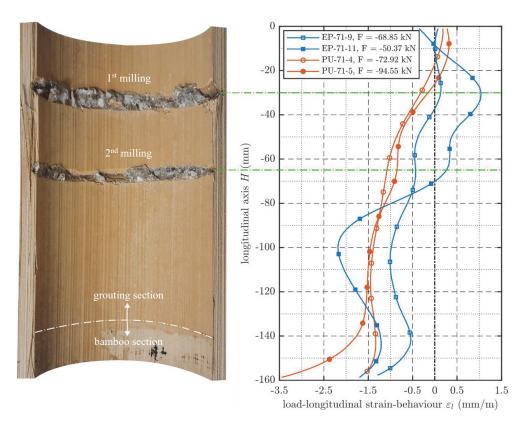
Part of inner bamboo layer (specimen EP-71-8) after testing (left), load-longitudinal strain-behaviour in the outer bamboo layer of four specimens shortly before failure (right).
